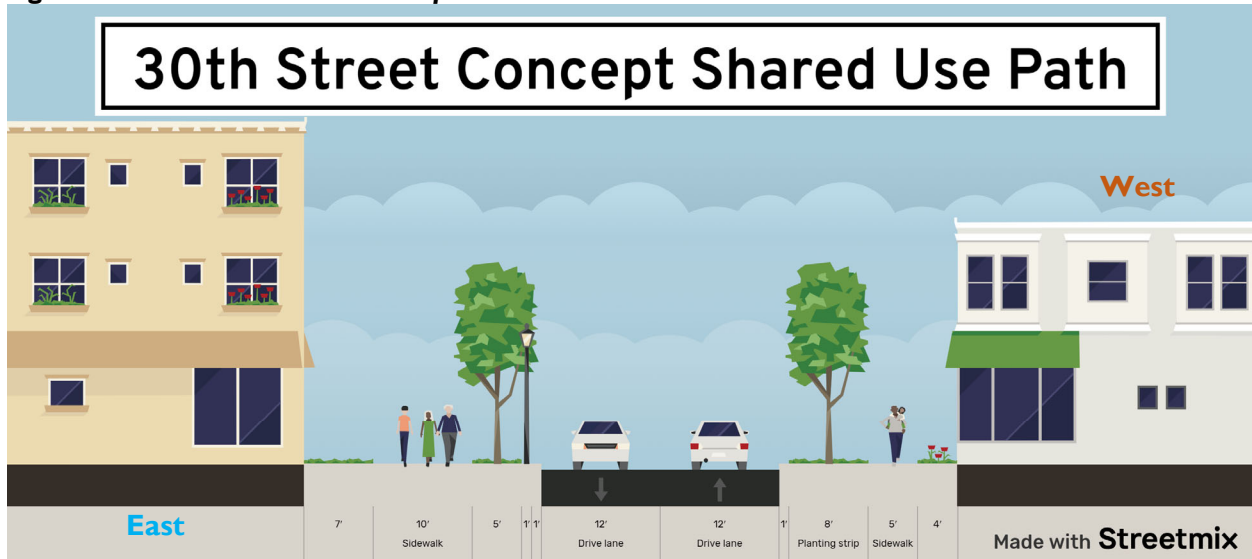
30th Street Concept Alternatives 2-B Cross Section
